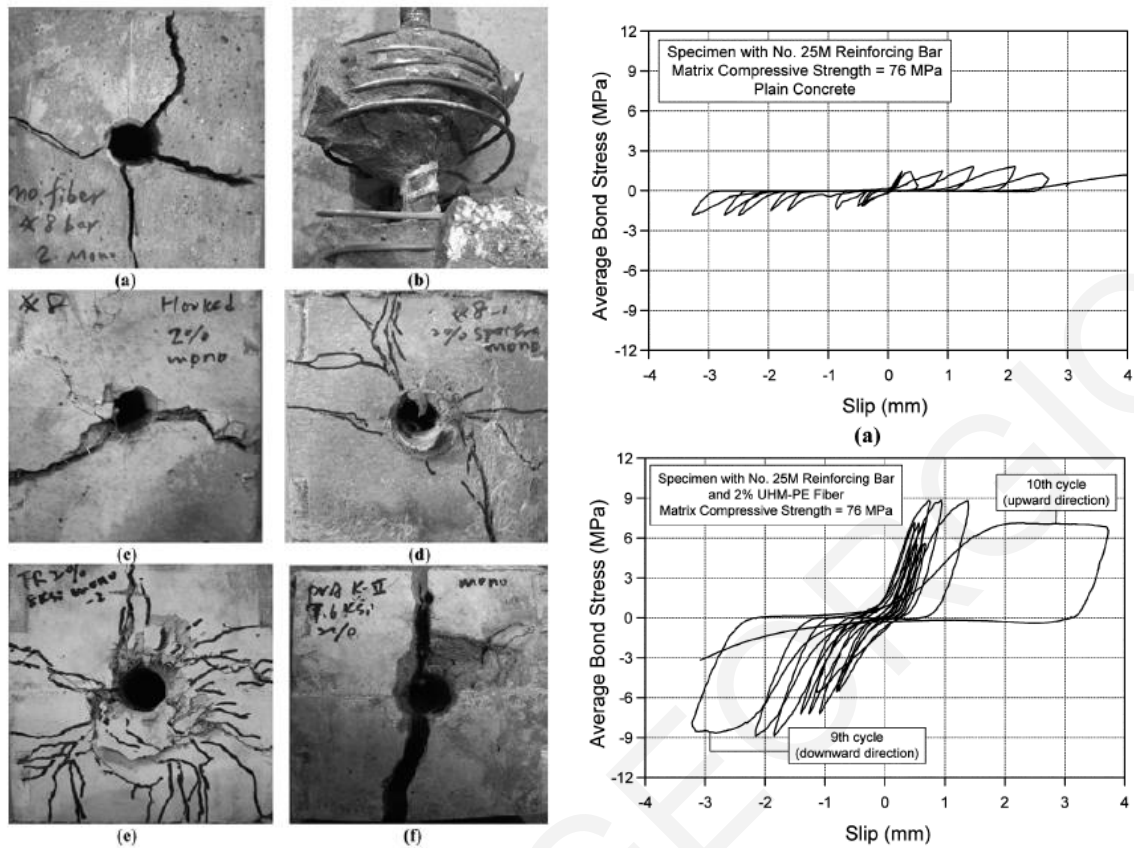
Cracking pattern in test specimens with various reinforcements under monotonic loading (No. 25M bar). Specimen with: (a) no fiber; (b) 2% spiral reinforcement; (c) 2% hooked steel fiber; (d) 2% UHM-PE fiber; (e) 2% rectangular steel twisted fiber; and (f) 2% PVA K-II fiber and Comparison of bond stress-slip responses under fully reversed, force-controlled cyclic loading. [152]
